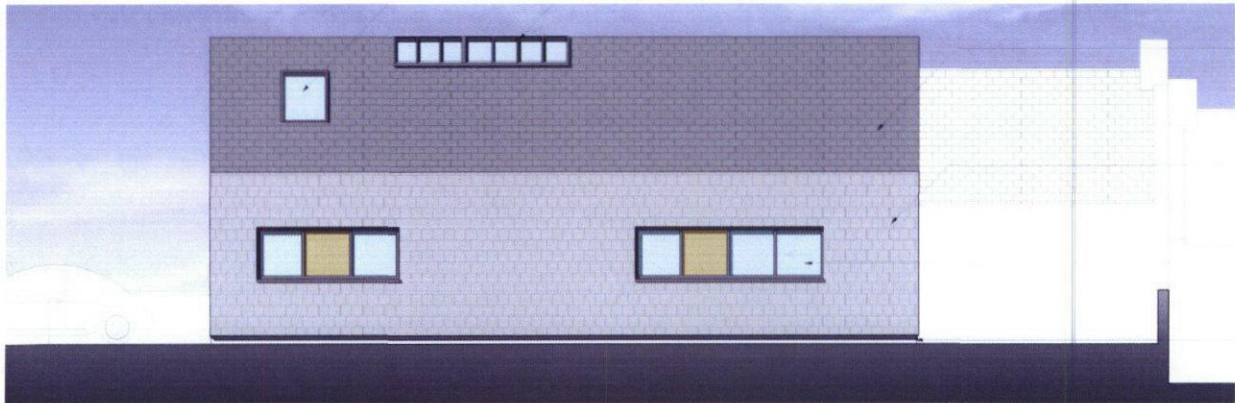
East Elevation of proposed new pitched roof & wall, clad in slate - Note that neighbouring property on James Street & all vegetation has not been shown to give clear indication of extent of elevation - whole elevation not normally visible in its entirety from James St.
